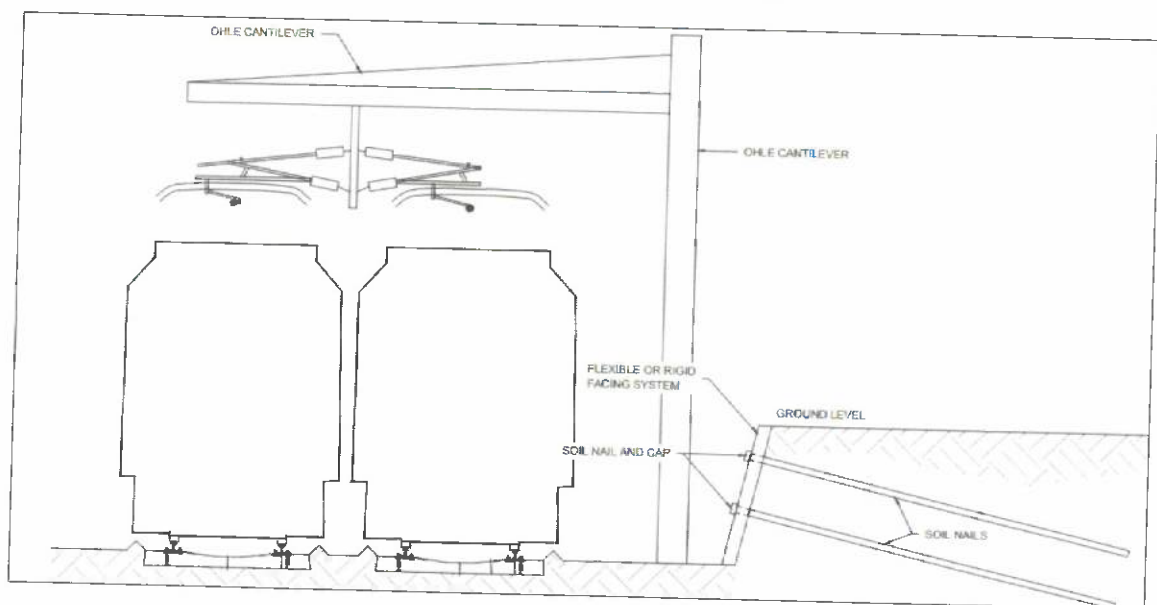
Section of the soil nail arrangement proposed along the west of the subject site.
